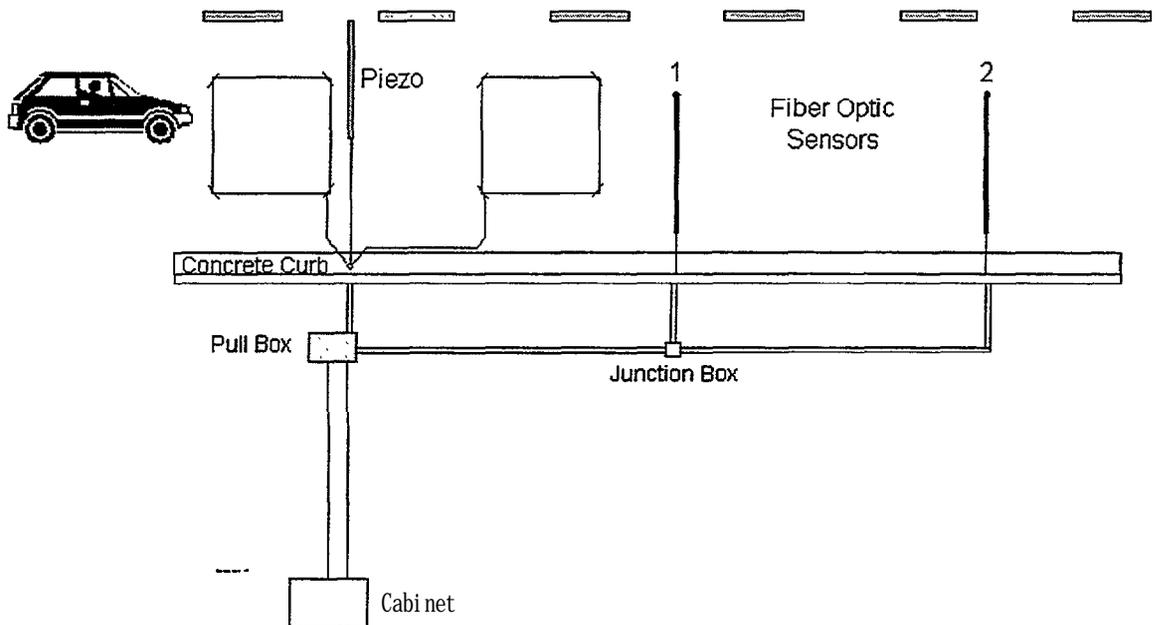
Layout of the Florida Tech/FDOT Smart Pavement Section
